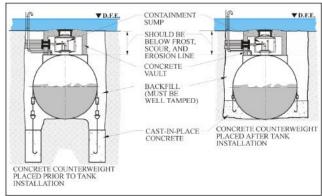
D: An underground fuel tank anchored onto poured-in-place concrete counterweights
